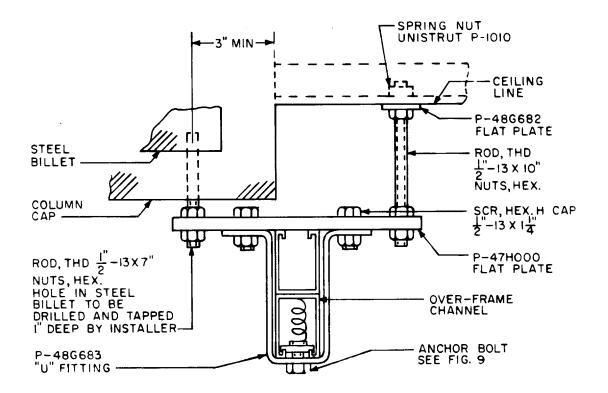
Fastening Overframe Channel to Ceiling and Column Cap (A&M Only)
